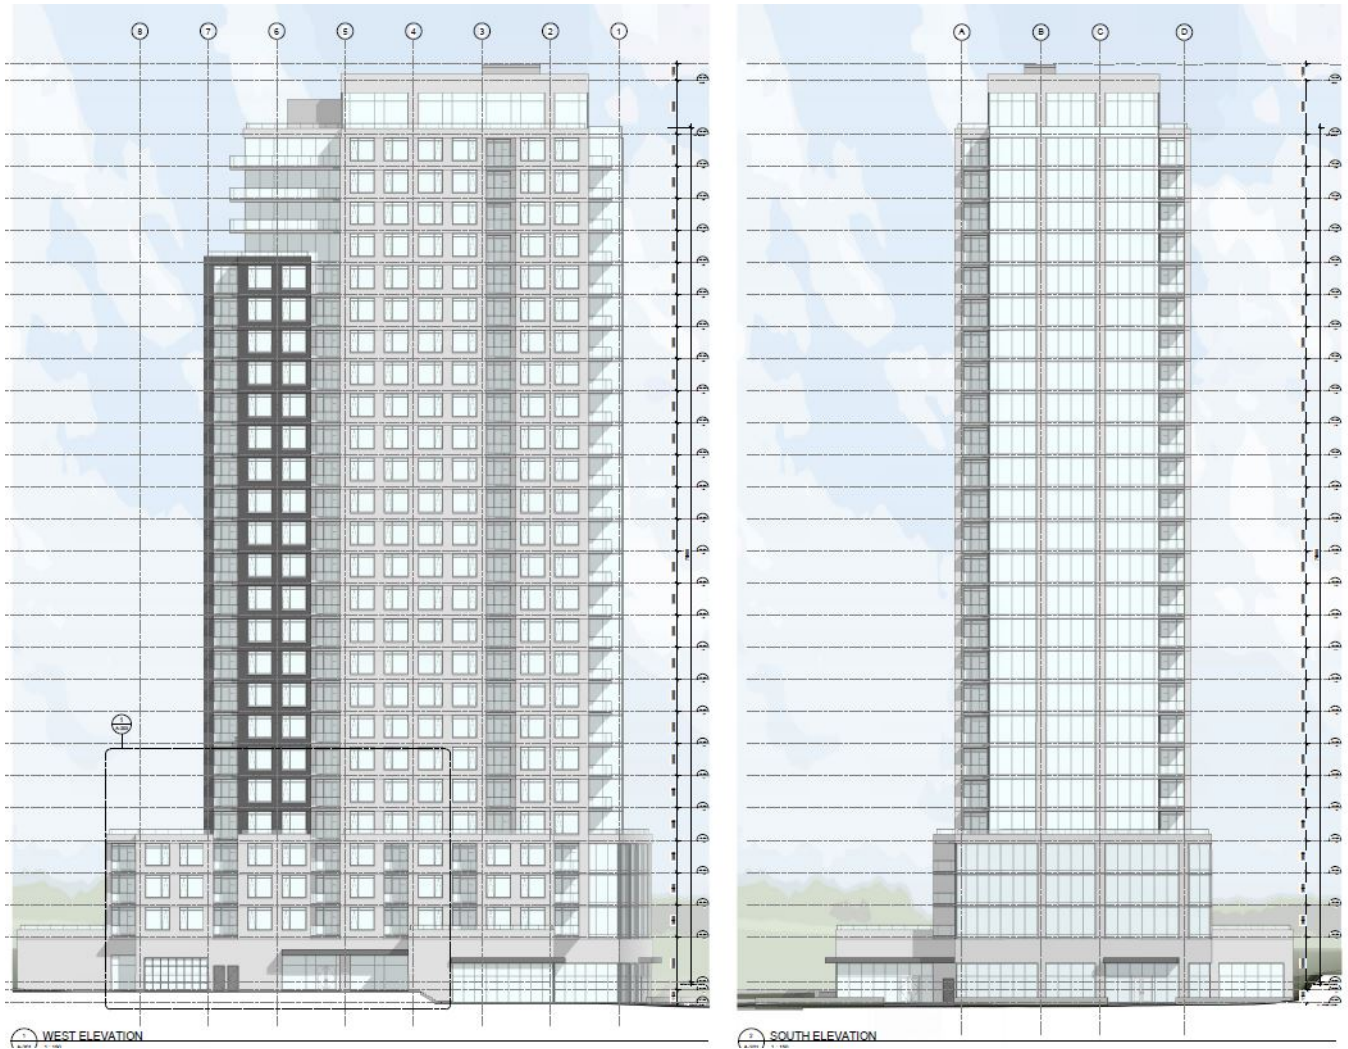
Proposed Elevations – South (Montreal Road), and West (Blair Road).
